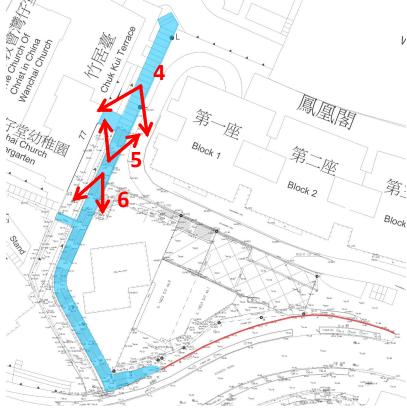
EXISTING SITE CONDITIONS (Spring Garden Lane Staircase)
